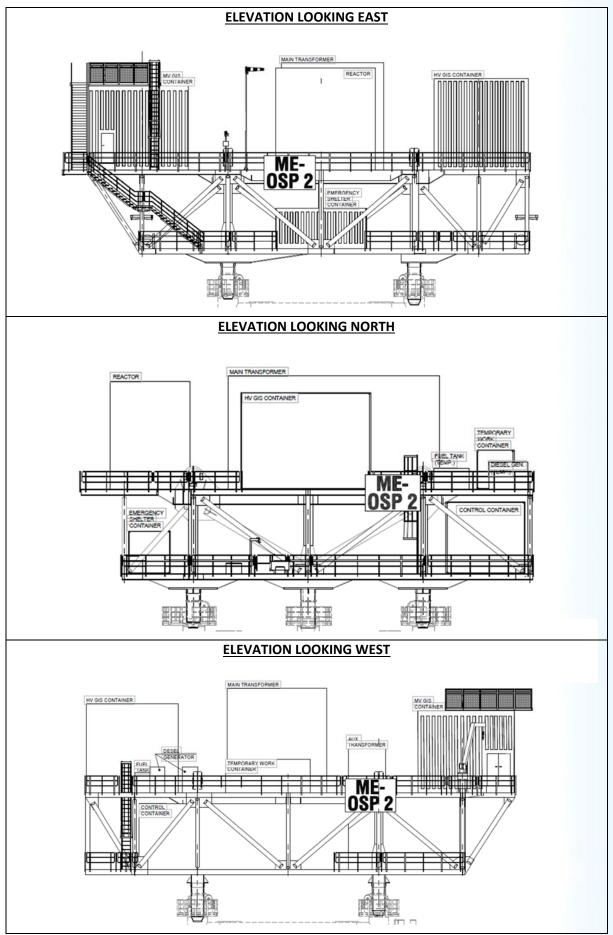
OSP general arrangement of topside – side elevation, end elevation and reverse side elevation
